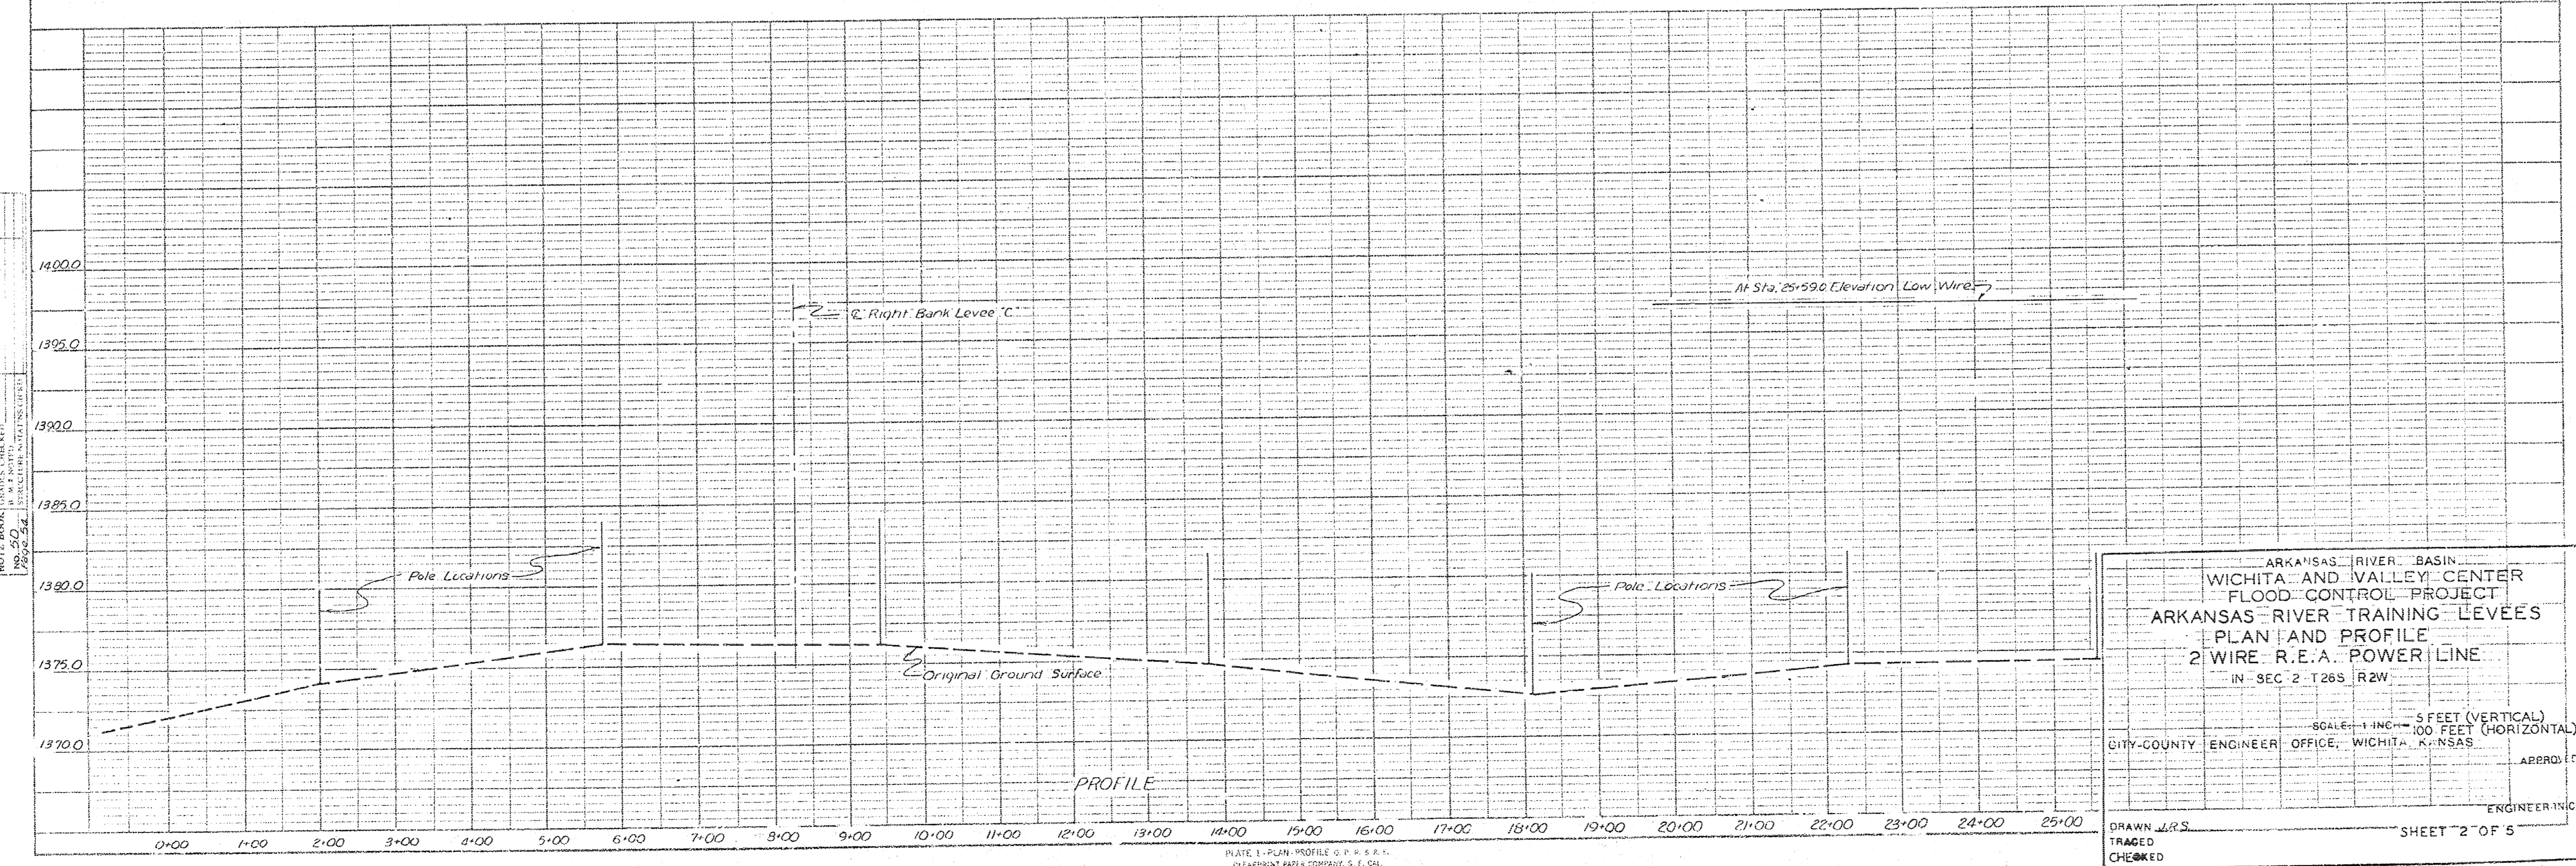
PLAN AND PROFILE R.O.P.A.A.C.
